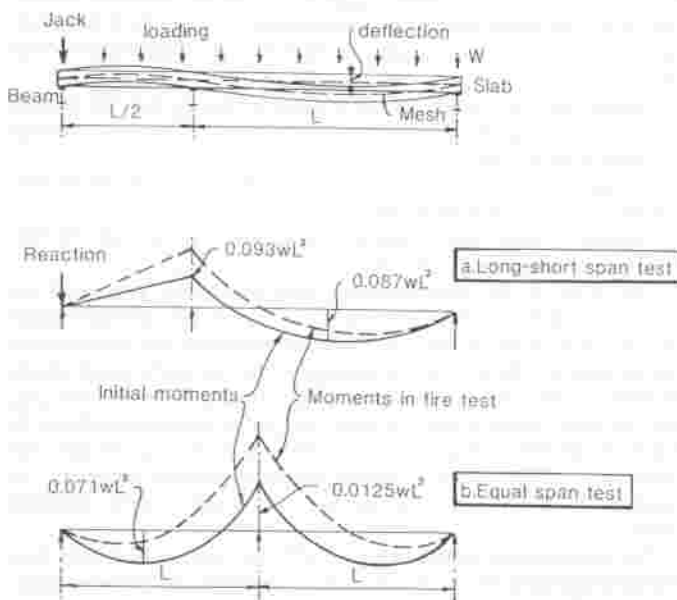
Test configuration and moments in fire tests on composite deck slabs
